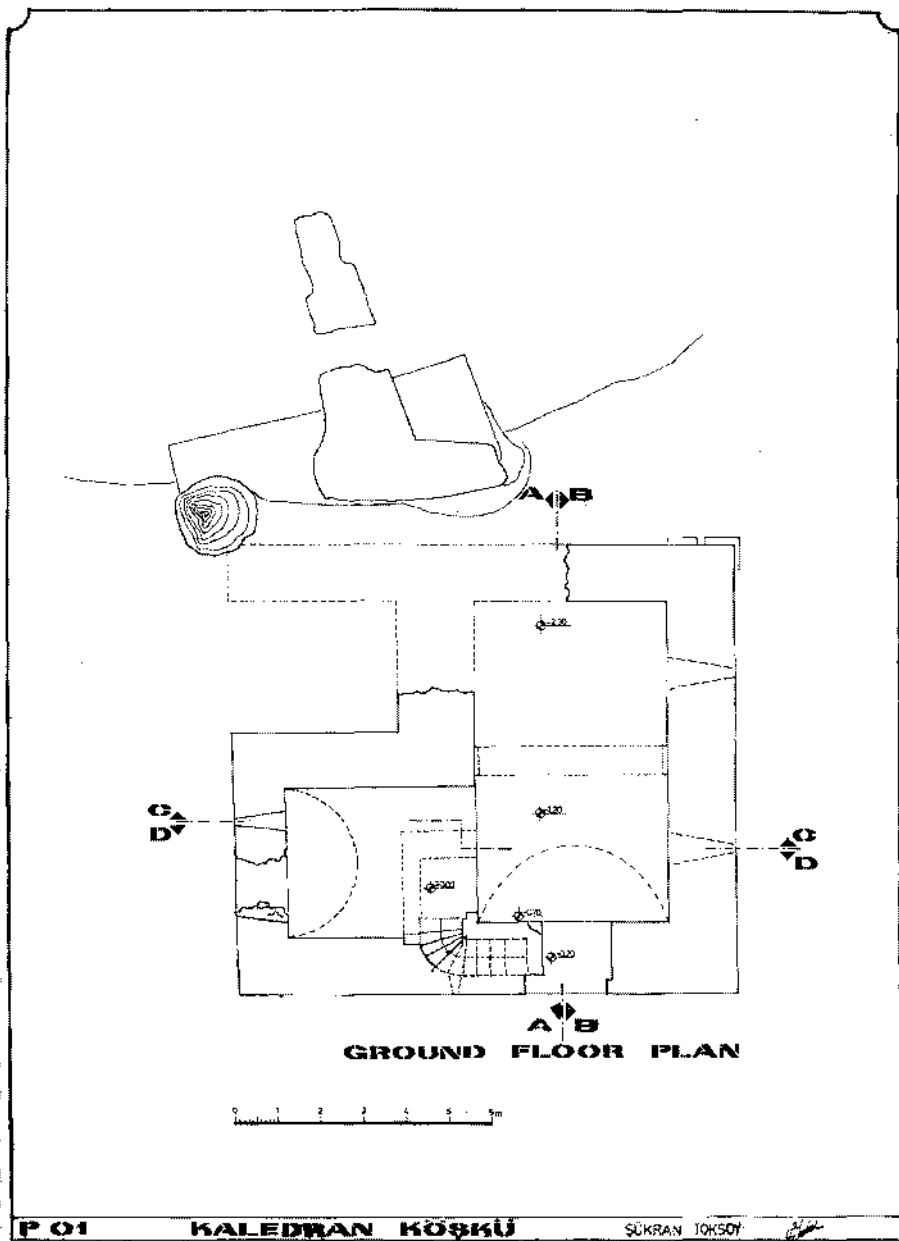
Kaledran kiosk, Kaledran, plan, ground floor
